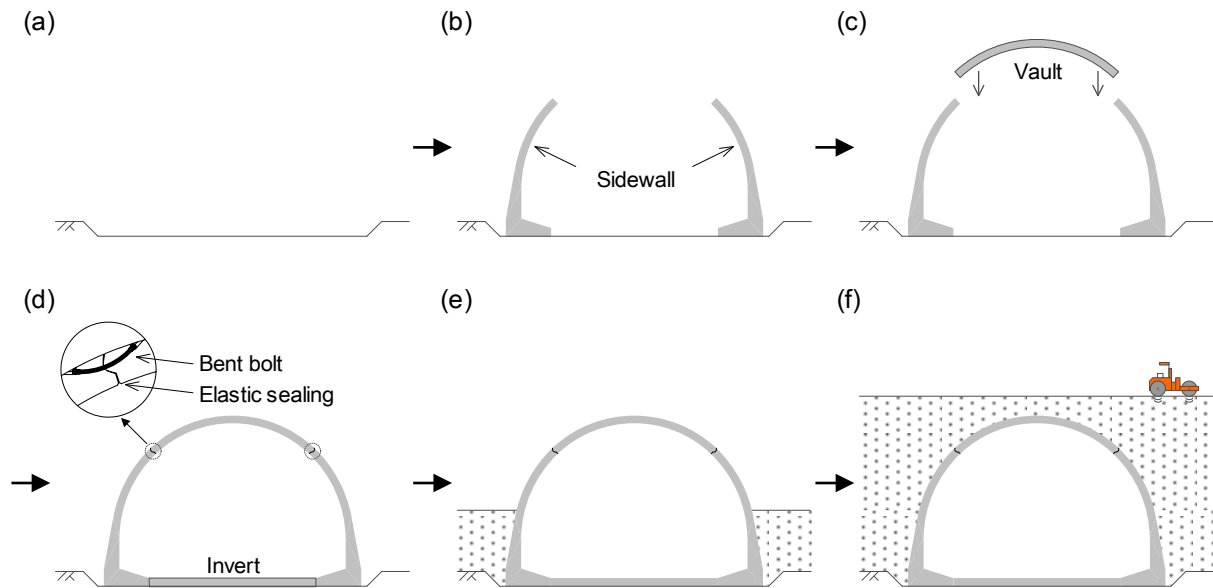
Construction procedure for two-hinged type of precast arch culvert: (a) construction of foundation ground, (b) setting of sidewalls, (c) setting of bolts, (d) casting in place of invert foundation, (e) filling in sides of culvert, and (f) filling in whole embankment.
